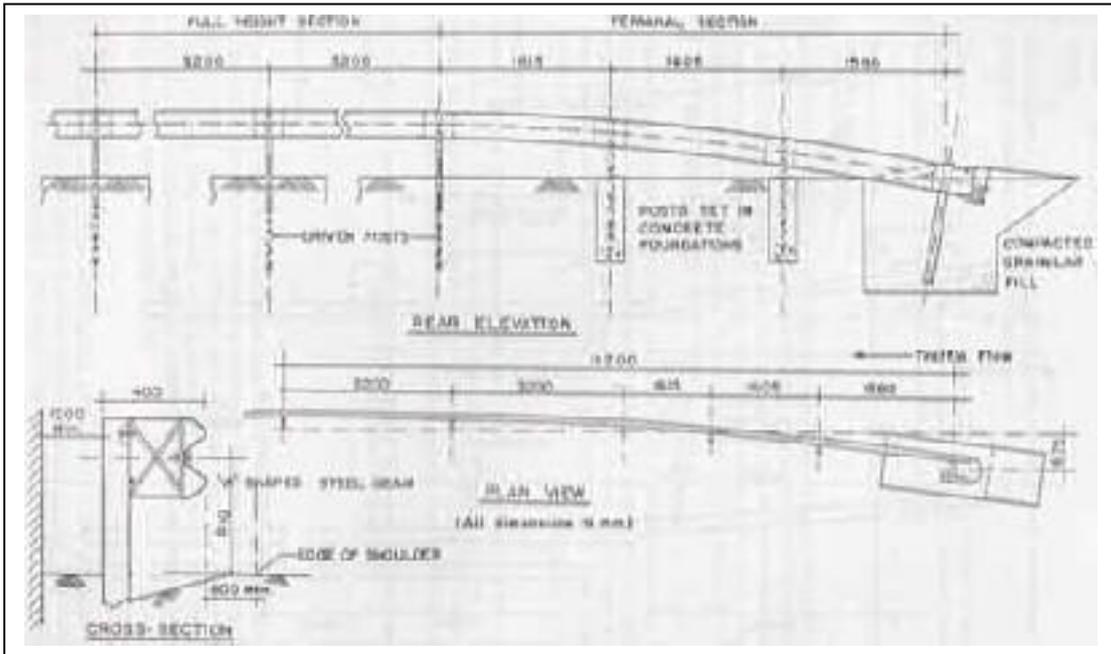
Corrugated steel beam barrier – untensioned (Adapted form UK Highway Construction details, Vol 3, Section 2)
